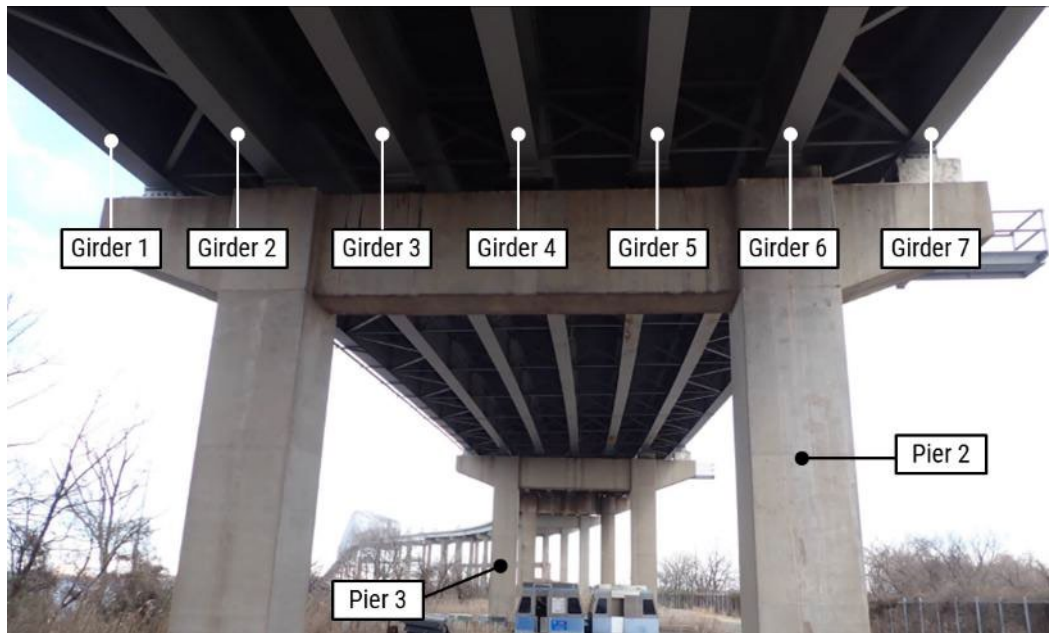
Painted continuous steel girders. (Background source: MDTA)
